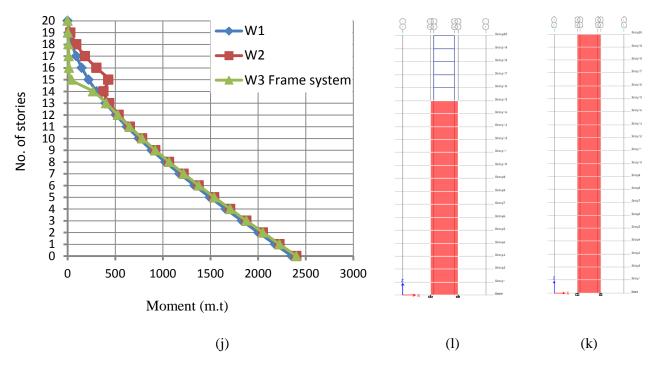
(j) Represents the comparison of bending moment results between W1, W2 and W3-(k) Elevation of W3 shear wall modified to frame system at 15<sup>th</sup> floor- (l) Elevation of shear wall W1 for model 1 and W2 for model (1-d).
